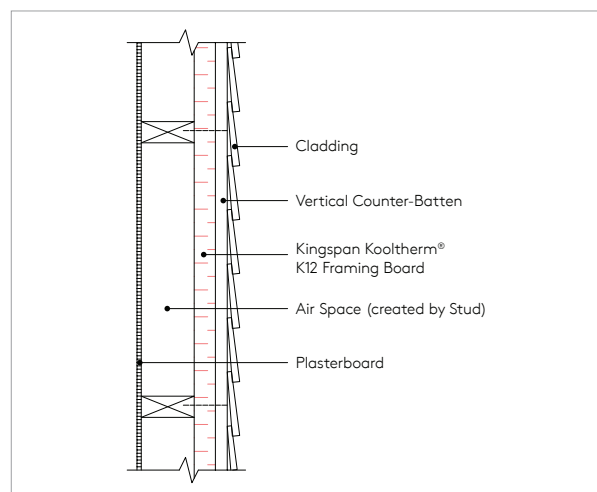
Side elevation – Stud wall with Kingspan Kooltherm® K12 Framing Board and vertical counter-battens using an internal plasterboard lining.
